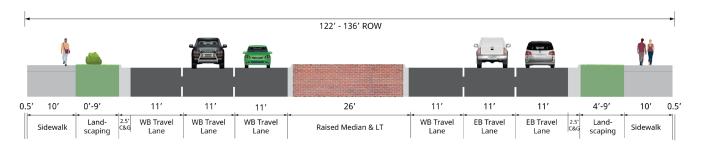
20250 East to Liverpool Street/Picadilly Street Typical Section
